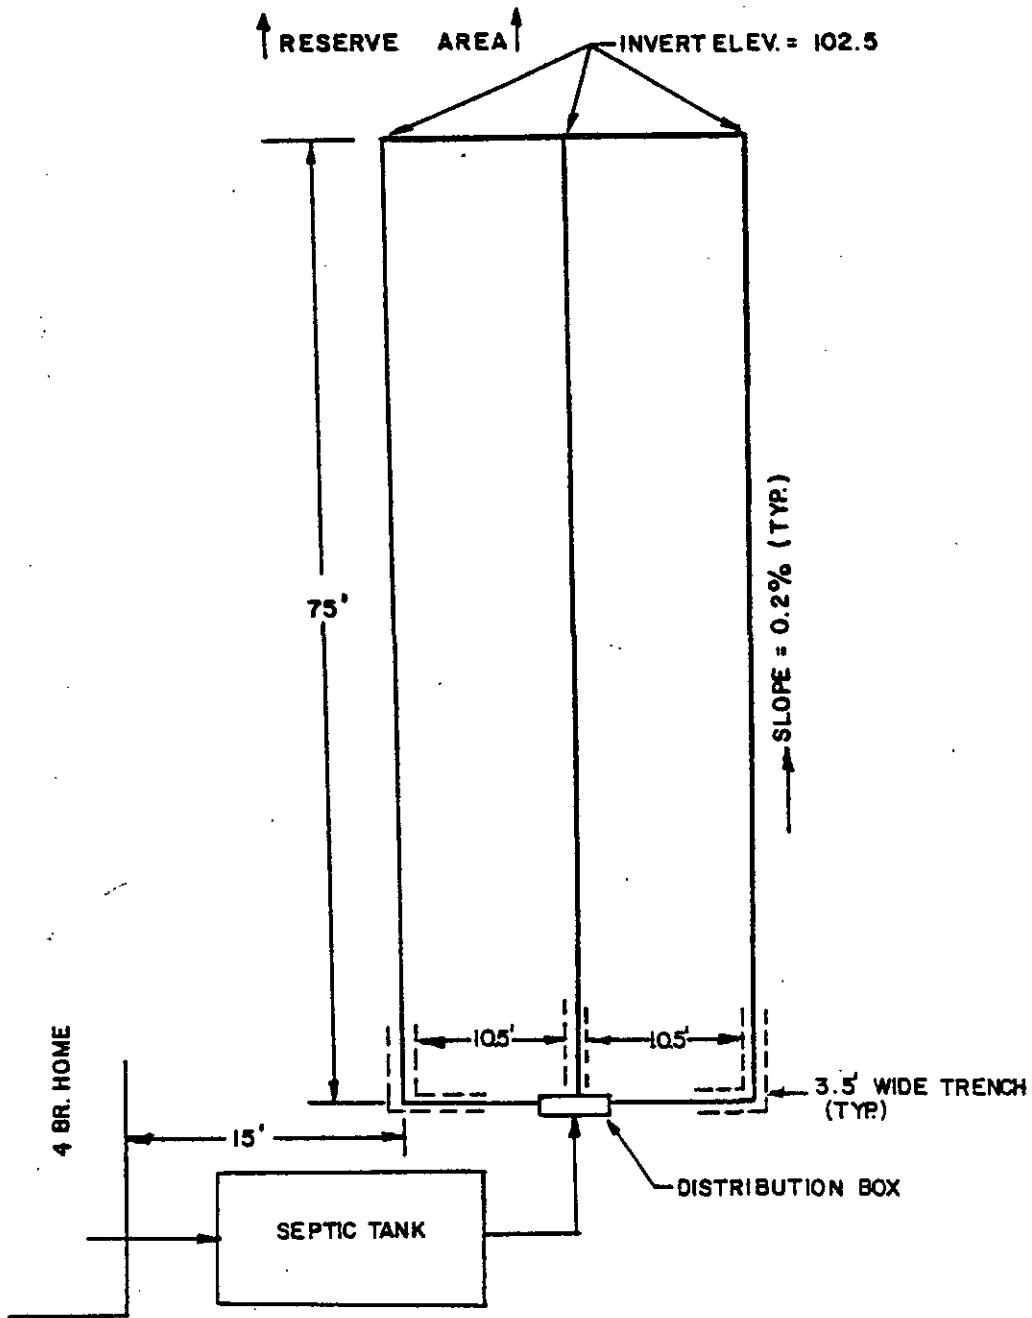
FINAL ABSORPTION TRENCH CONFIGURATION
